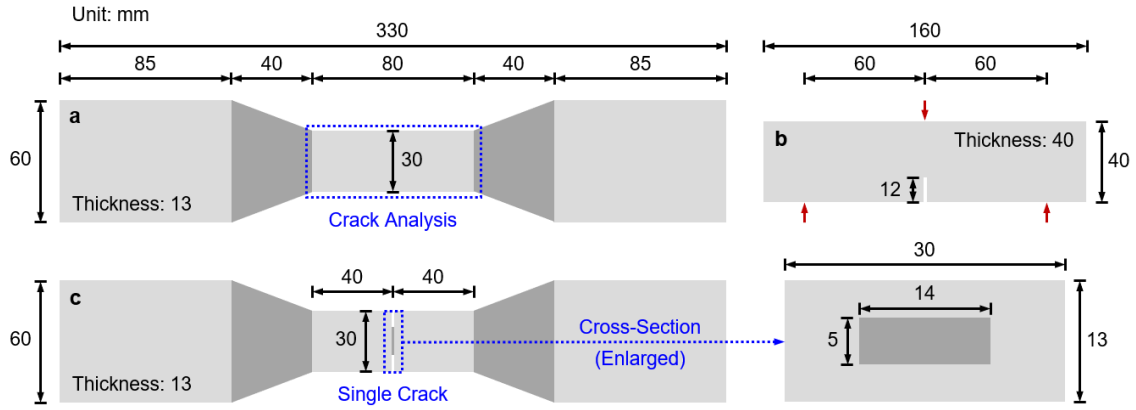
Dimensions of specimens for (a) direct tensile test, (b) fracture toughness test, and (c) single-crack tensile test.
